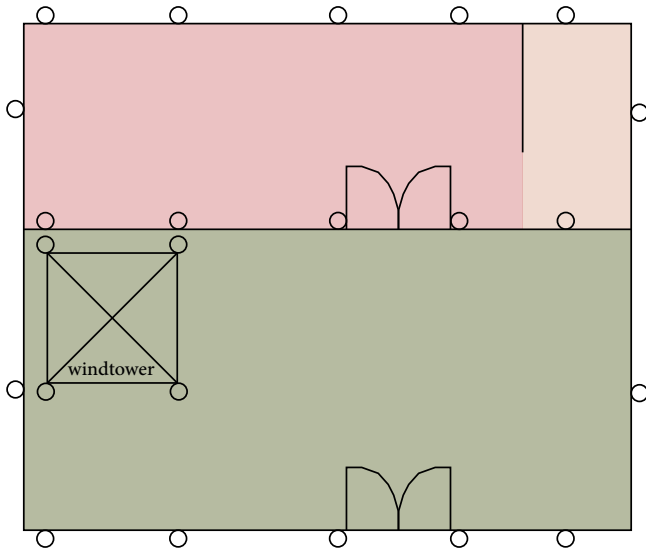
, a redrawn typical plan of the Arish house reconstructed in Dubai Museum (Piesik, 2012, p. 130).
